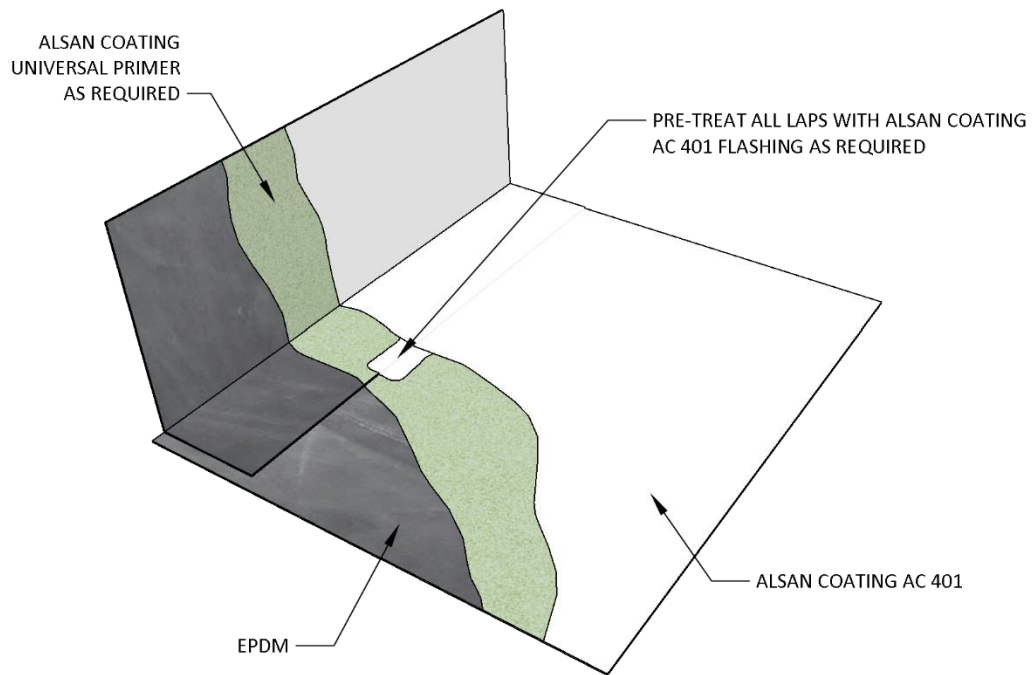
Acrylic Roof Coating Over EPDM, Wall/Curb
